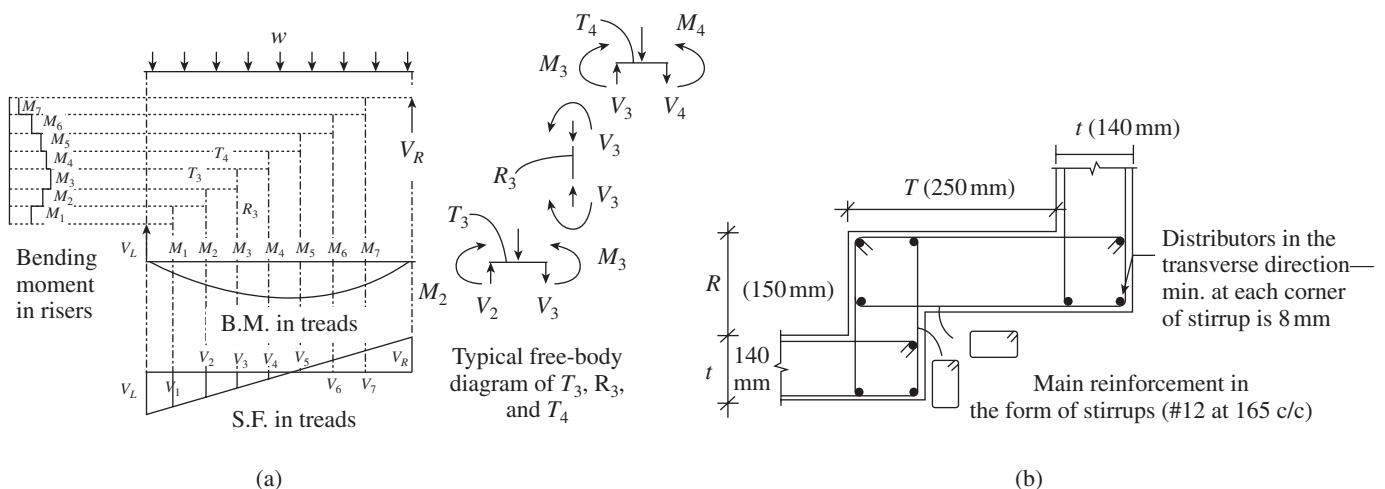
Longitudinally supported tread-riser stairs (a) Bending moment and shear force diagram (b) Detailing of reinforcement
